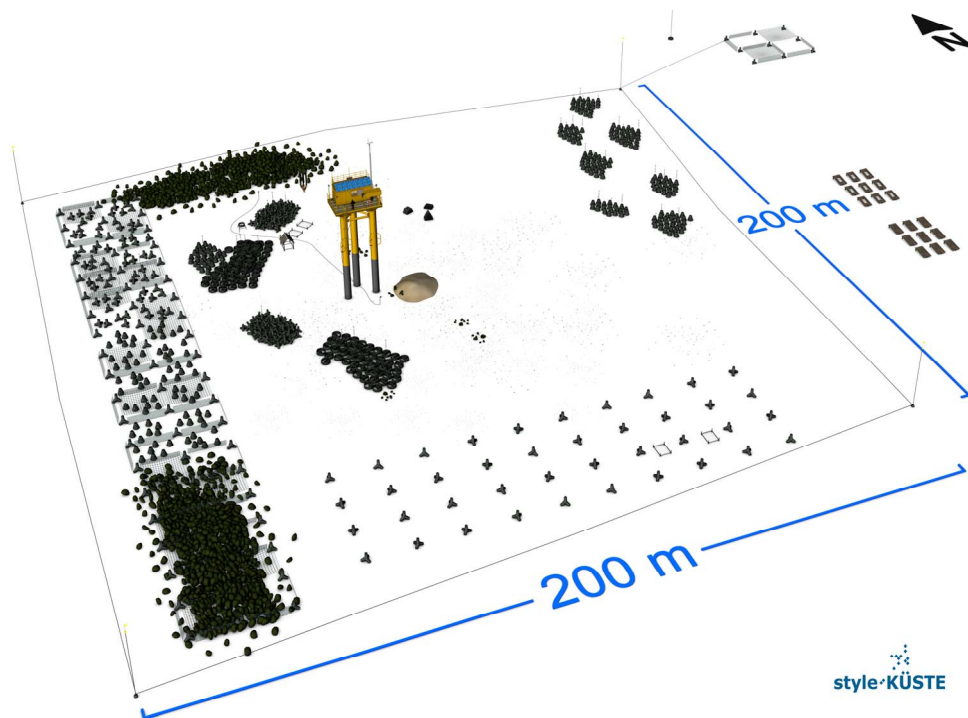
Arrangement of the structural elements on the artificial reef Nienhagen (style Küste).
